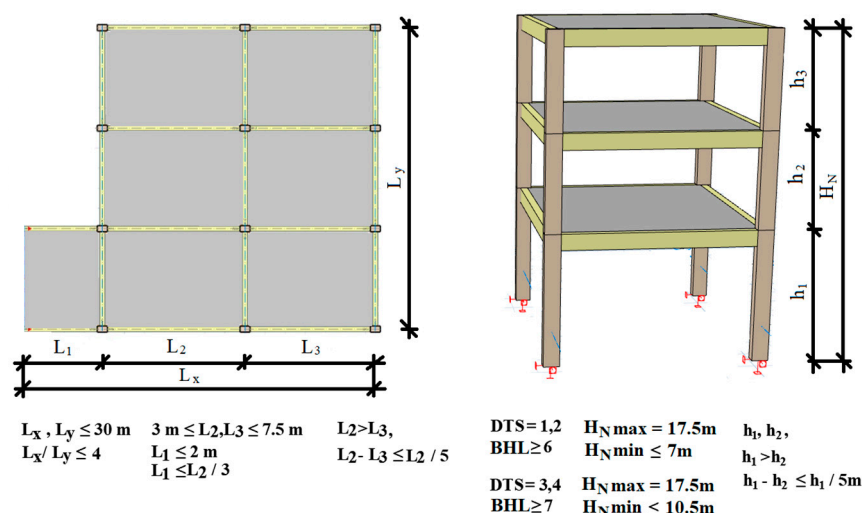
Building height limits according to building floor model plan limit values and earthquake design classes.
